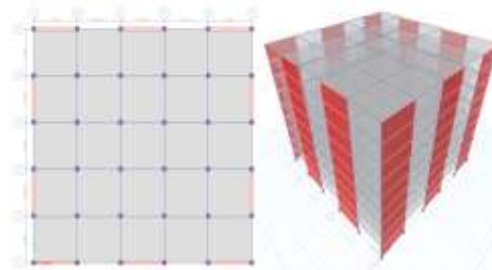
Edge Shear wall + Corner shear wall model
